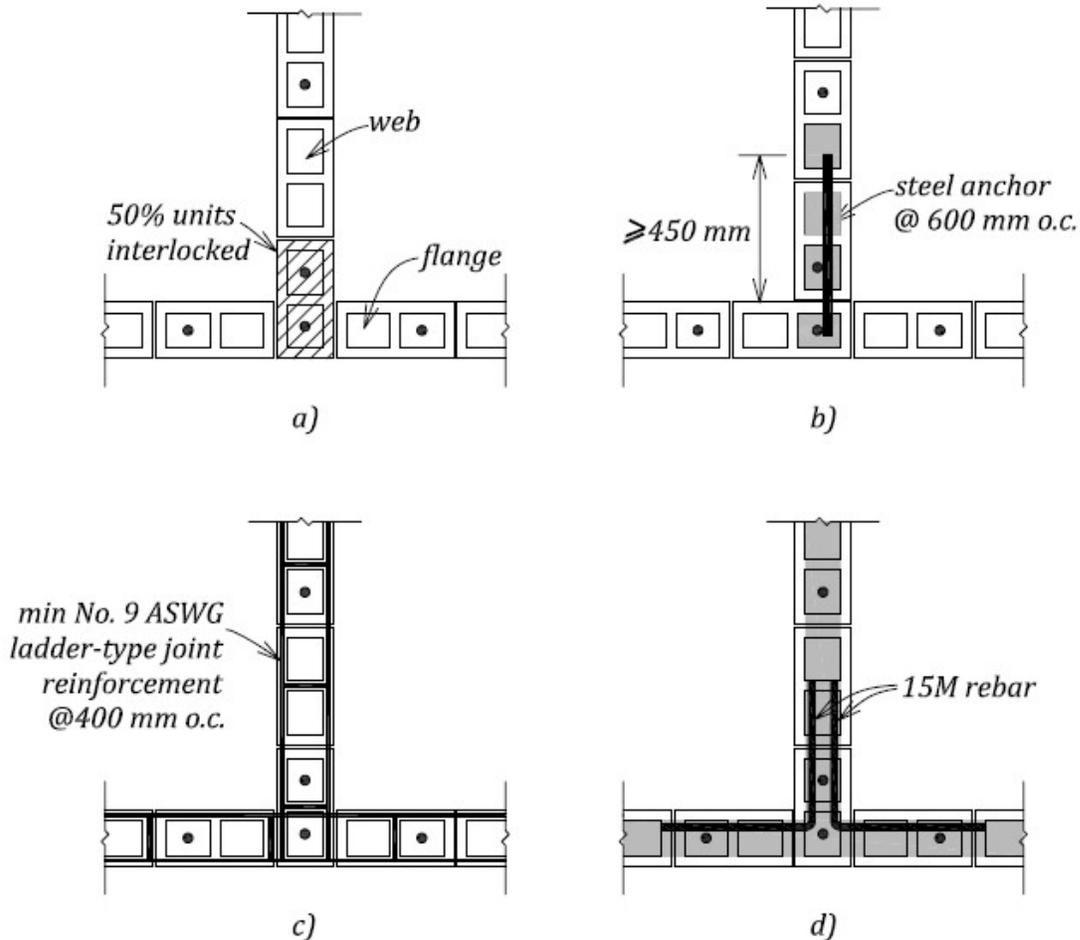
Masonry wall intersections: a) bonded intersections; b) mechanical connection; c) horizontal joint reinforcement; d) horizontal reinforcing bars (bond beam reinforcement).
